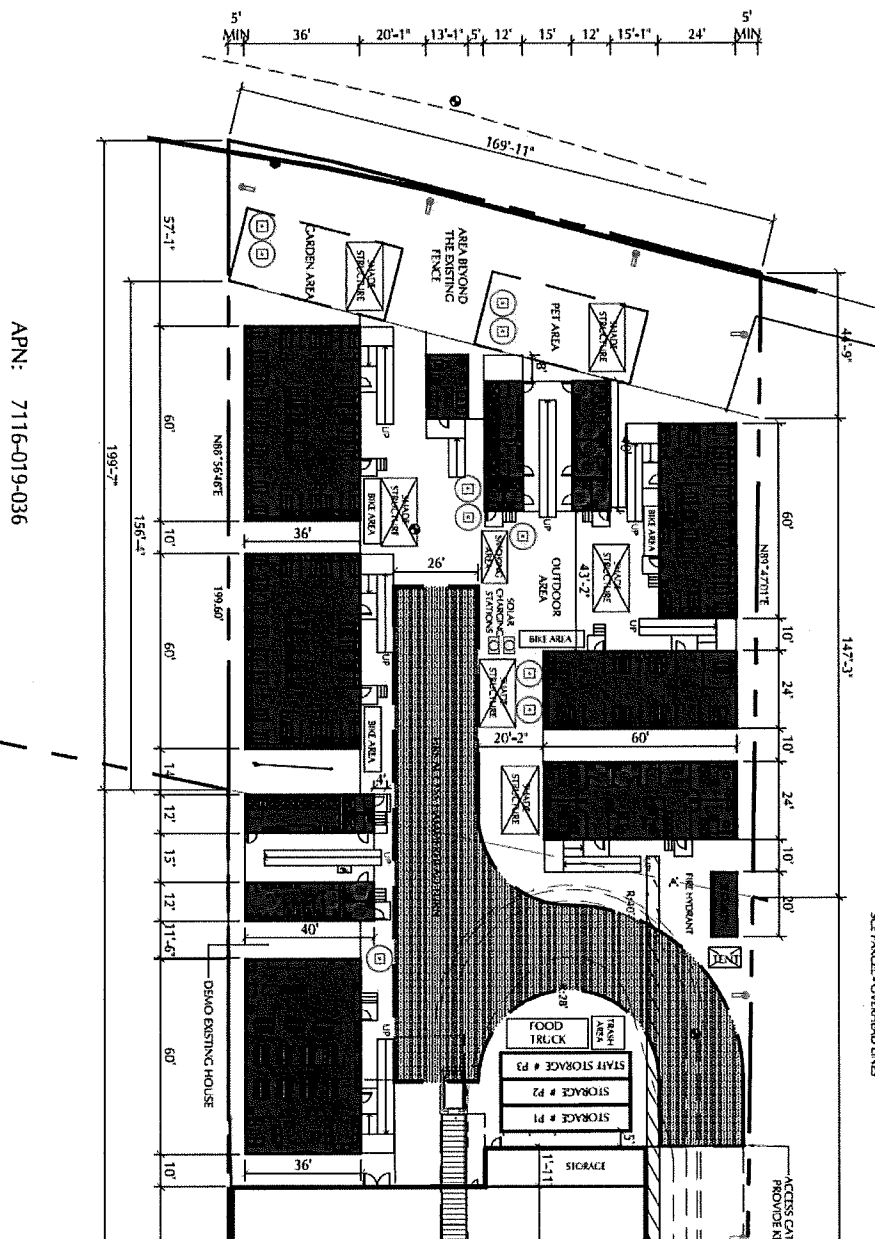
EXHIBIT ABuilding SpecificationsDESCRIPTION24 x 60R-2 NON-RESIDENTIAL
